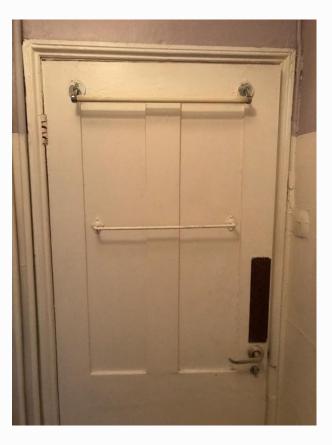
The 20th century part glazed door into the rear ground floor room. The architrave here was used as the pattern for the installed architraves. Fig 27 The architrave to the 1st floor bathroom door.
